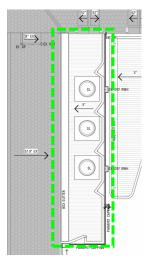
Extract of TP20 P2, showing the roof plan of the North Wing first level extension. Note that there are three circular skylights. Source: Y2 Architecture, 2023.
